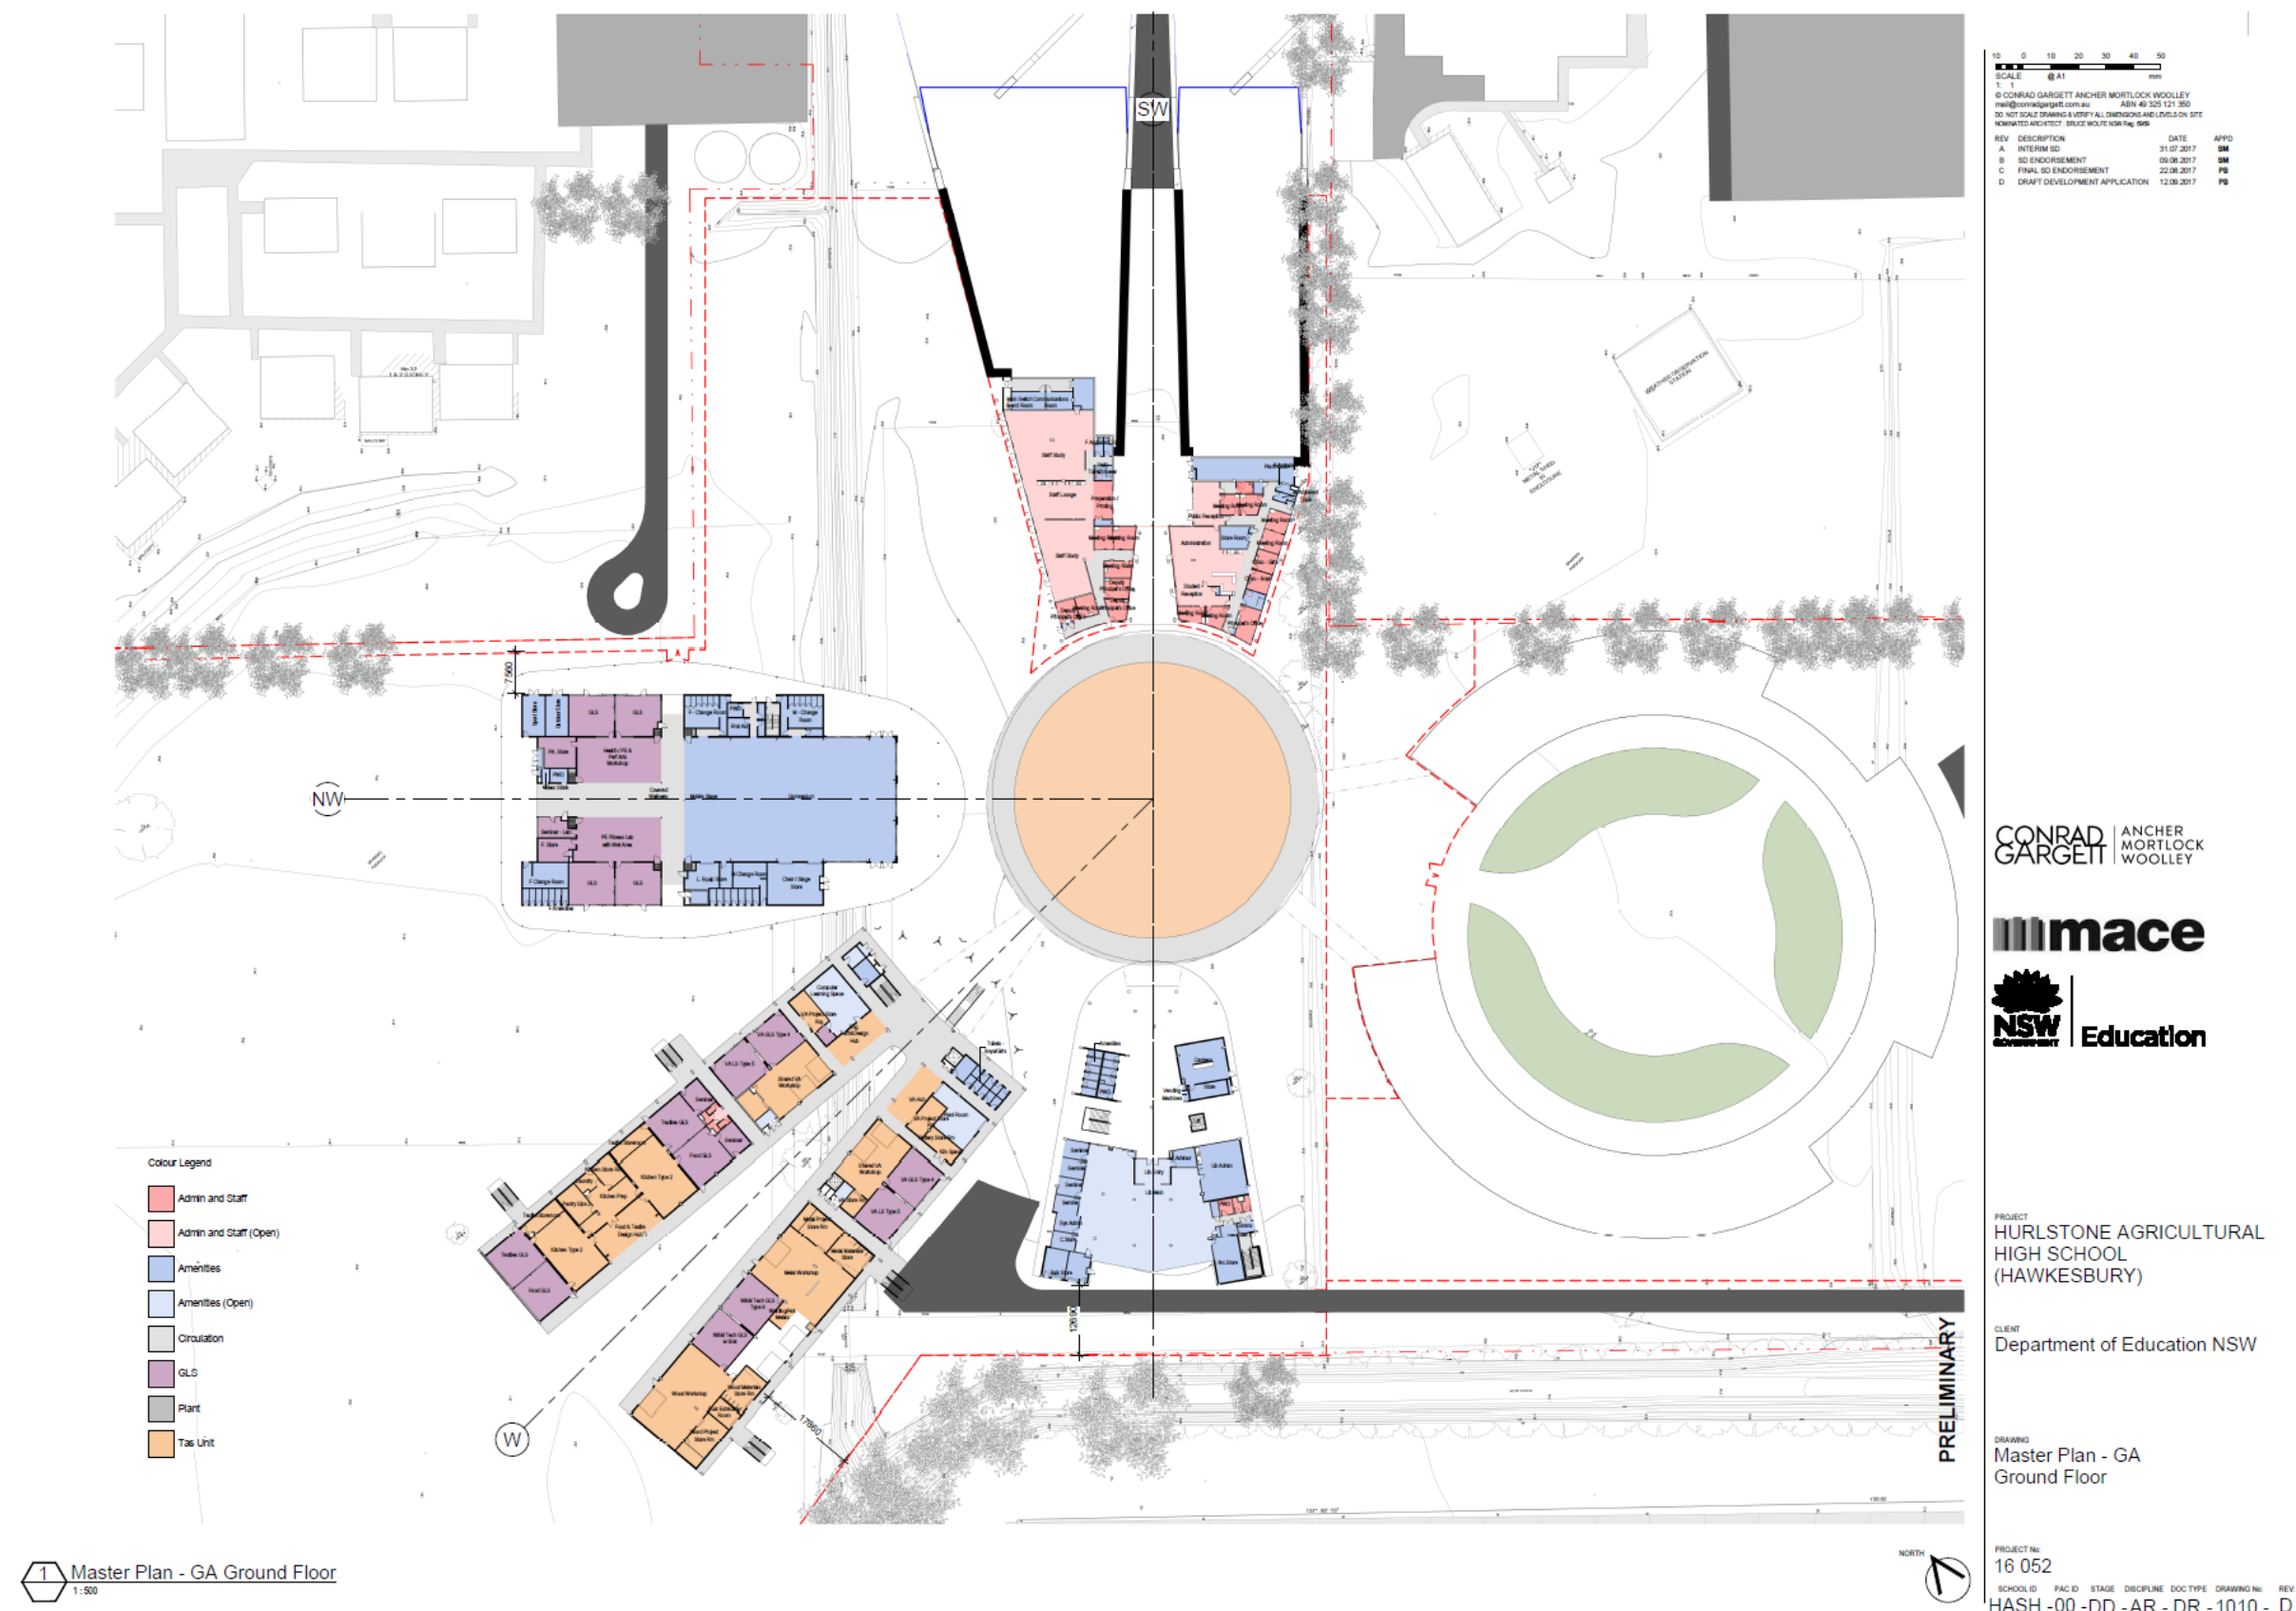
Proposed Master Plan – GA, Ground Floor
